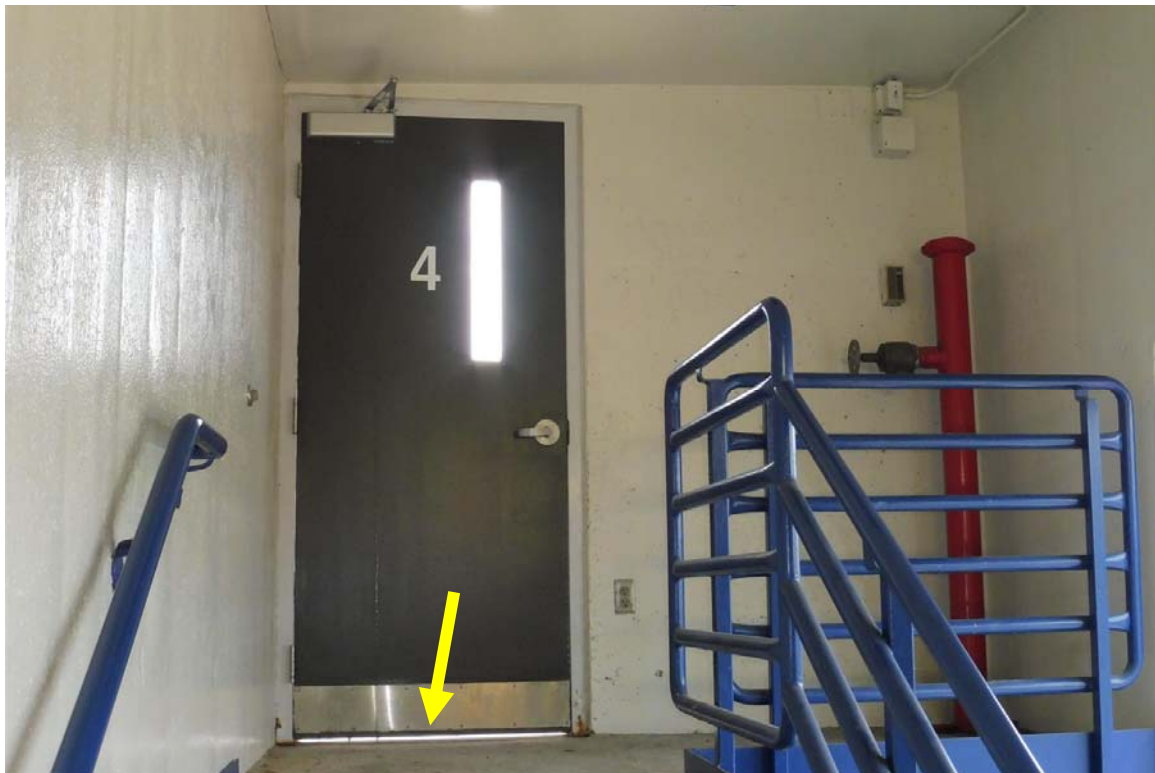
Similar to the southwest stair, moisture has been infiltrating the northeast tower via the gap below the roof level door. Damage caused by the water can be seen in the following photos.
